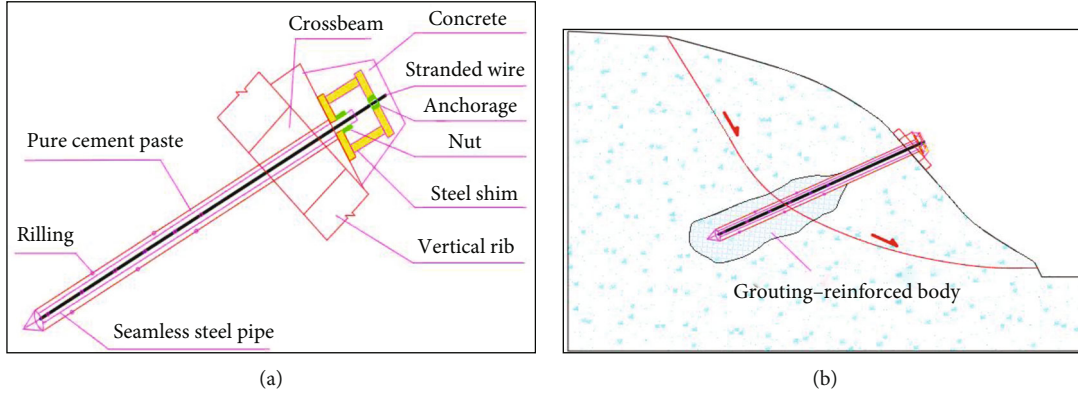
Structure and reinforcement mechanism of prestressed steel anchor tube frame beam. (a) Prestressed grouted steel anchor tube frame beam structure [32]. (b) Reinforcement mechanism of prestressed grouted steel anchor tube frame beam.
